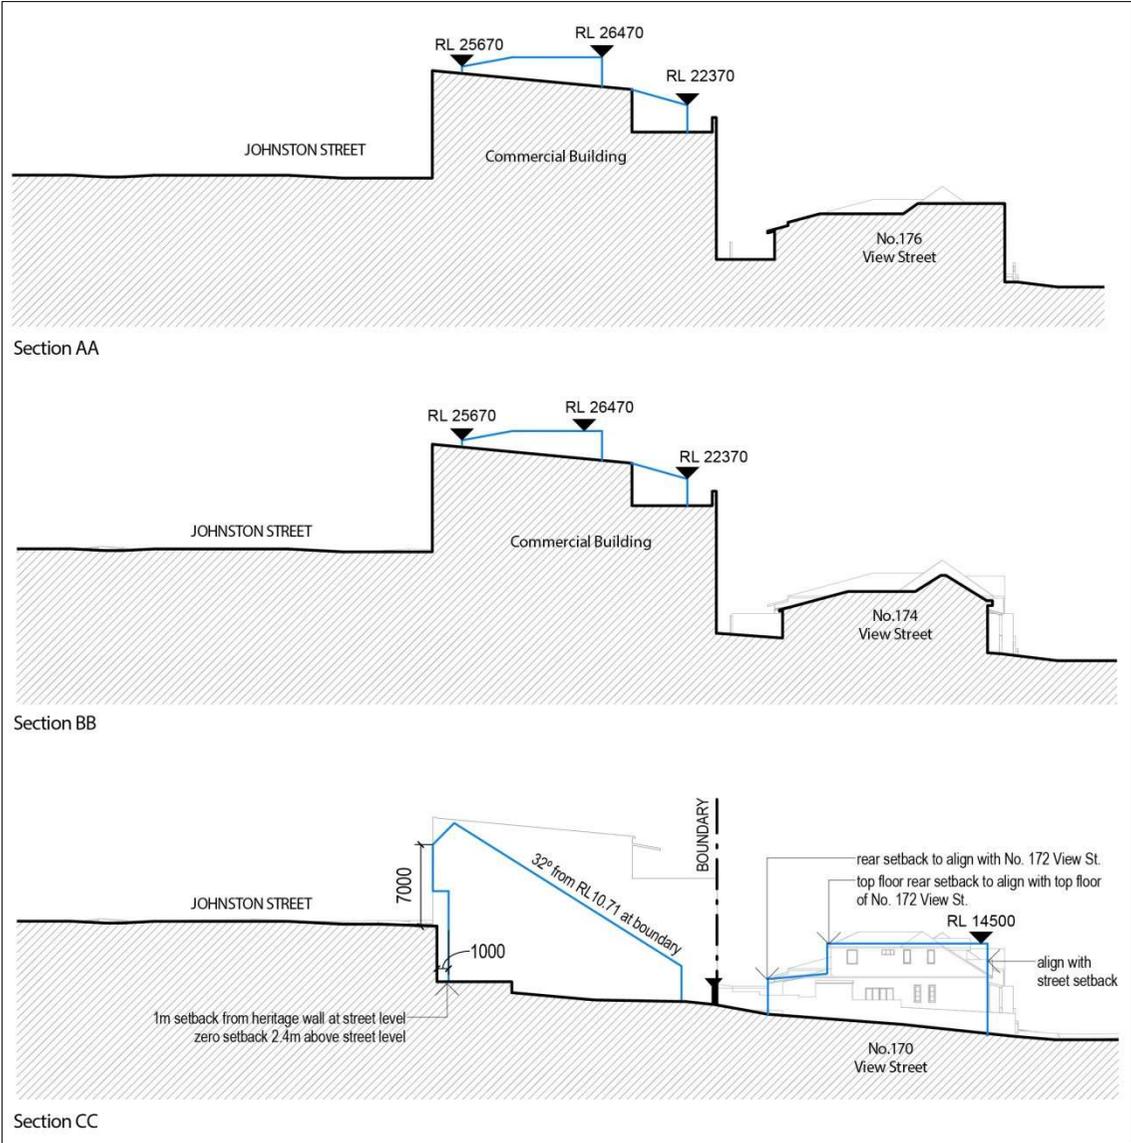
Building Heights and Massing Envelope – Section AA, Section BB & Section CC
